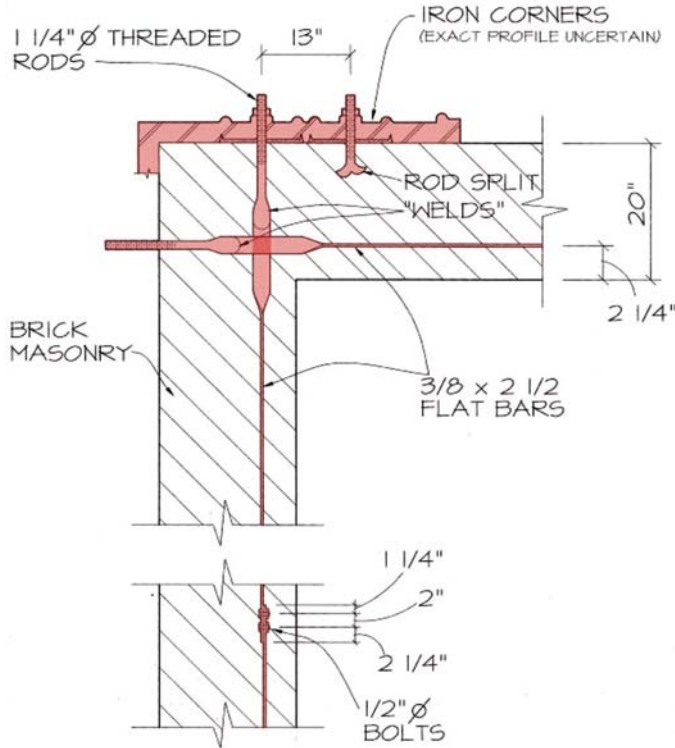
Diagram of bond iron in walls and attachment to external iron pilasters in South Hall.
